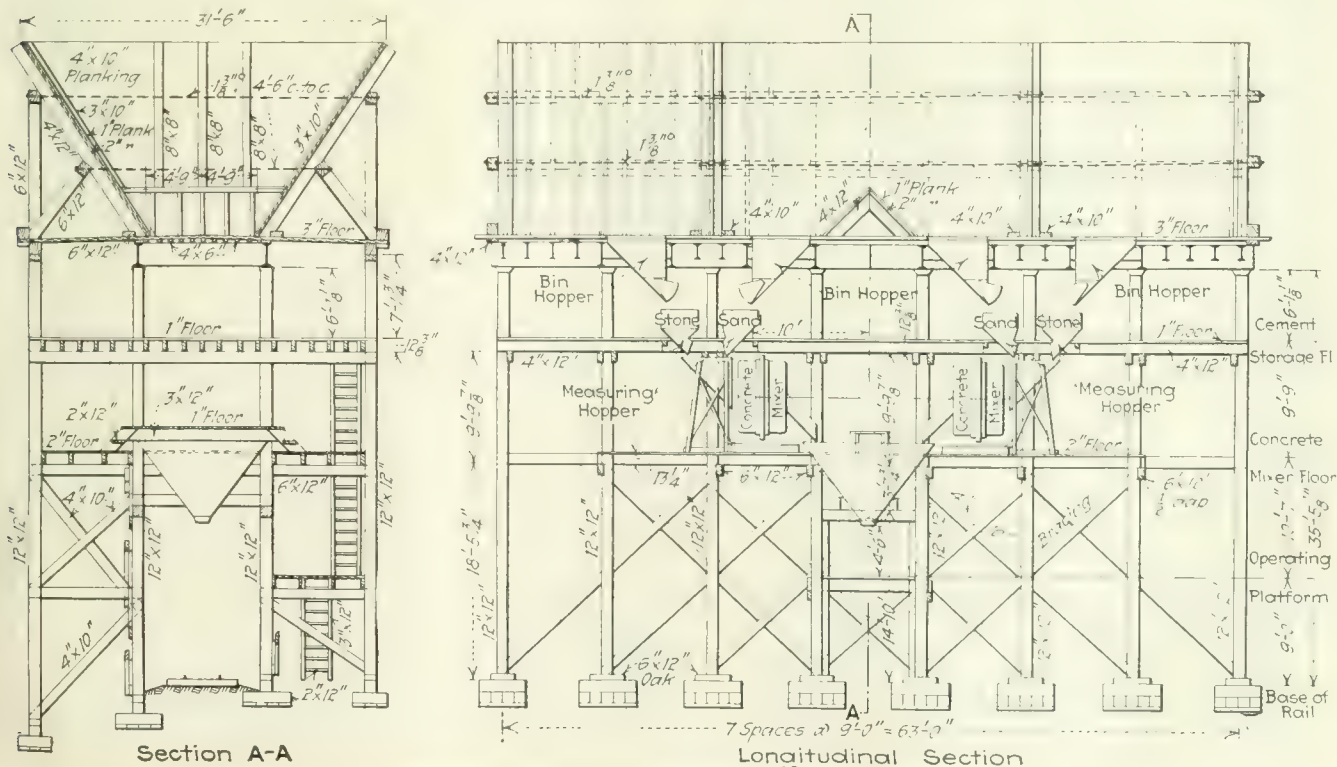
MIXING PLANT ARRANGEMENT BALDWIN RESERVOIR
